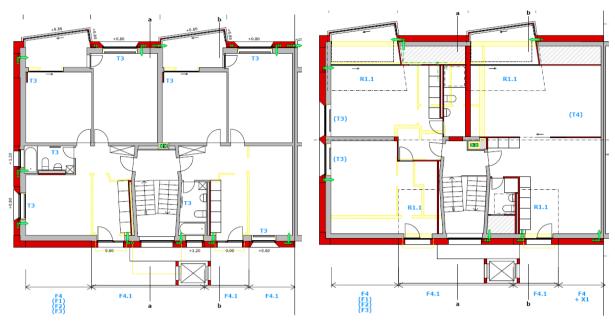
Floor plans for regular floor (left) and attic (right; source: Robert Fischer, HSLU)
